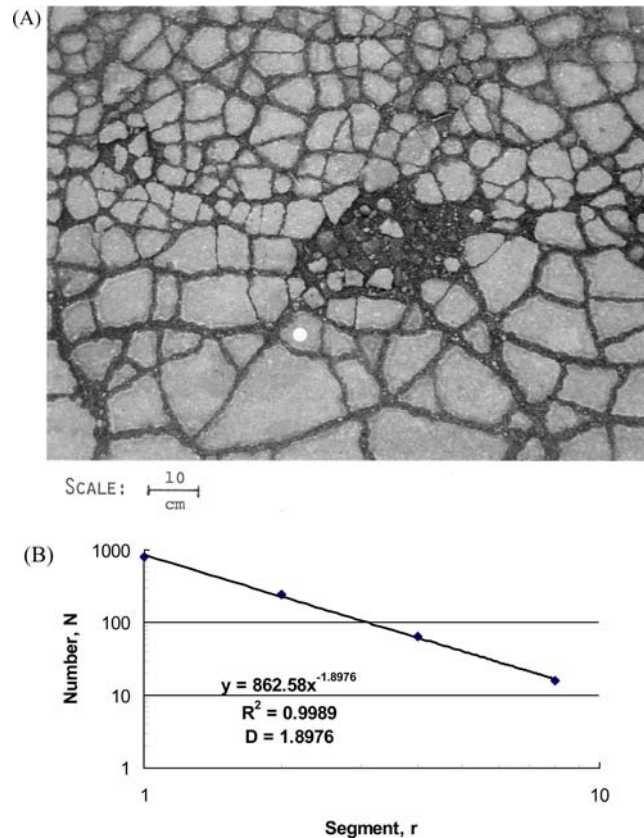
(A) Pavement with detachment level alligator cracking. (B) Fractal dimension,  $D$ , of the detachment level of alligator cracking shown in (A).
